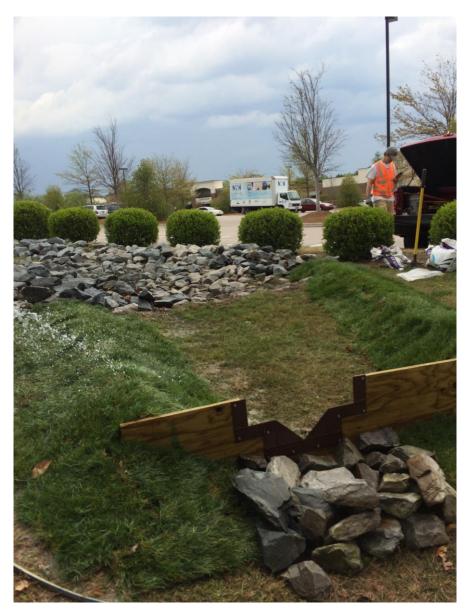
Compound weir installed to monitor parking lot runoff at DT.
